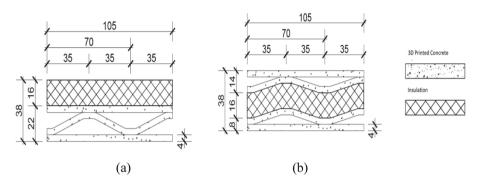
Top view of the different wall types: (a) structural wall and (b) insulated wall (dimensions in [cm])
